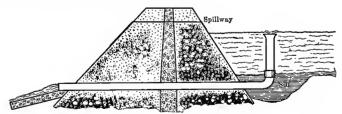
Dam and relief drain to prevent gulling and to catch silt.
